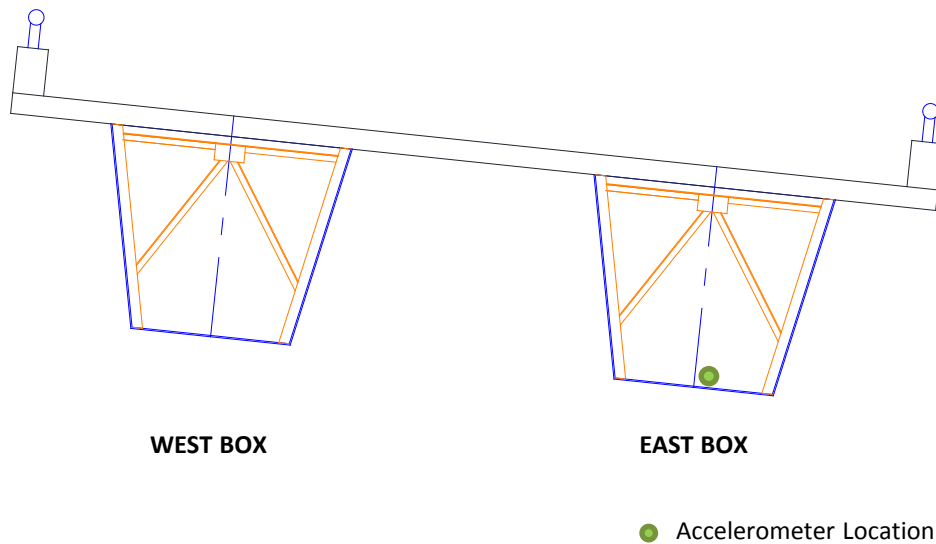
Cross-section view of the US-290 Bridge showing typical accelerometer location on the bottom flange of the east box girder.
